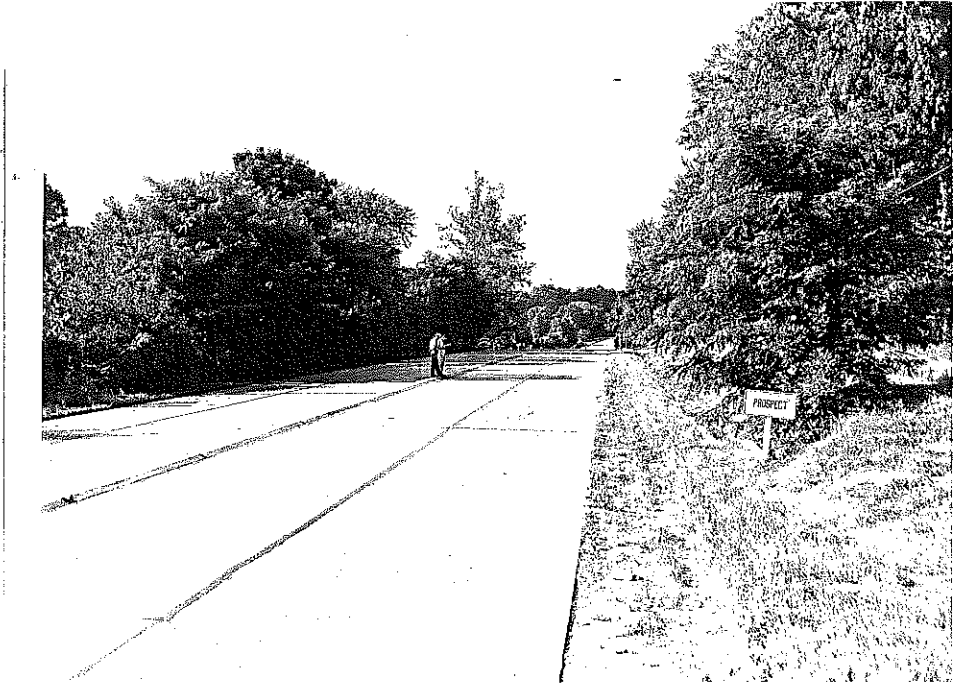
Proj. SN-FA 194 E(3), Louisville-Cincinnati Road. Pavement in foreground contains a 5:1 blend of portland cement and natural cement without grinding aid, while that beyond the point where men are standing on the dividing strip contains normal portland cement.
